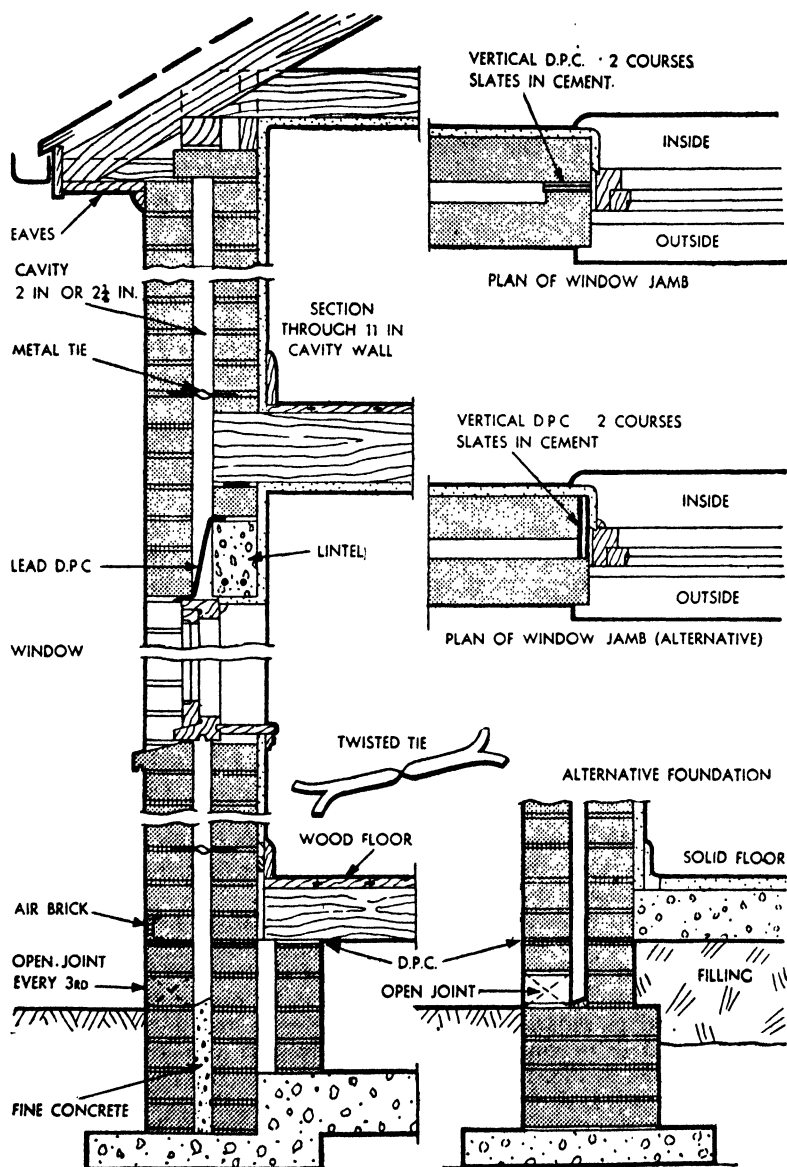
Details of sound practice in cavity-wall construction. Sheet lead is placed over window and door frames to prevent water soaking across window head and lintel; this lead should be carried through outer wall or over the head of frame as indicated. The methods of forming window and door jambs are shown, and also the position of the d.p.c. to prevent moisture from reaching inner wall.
